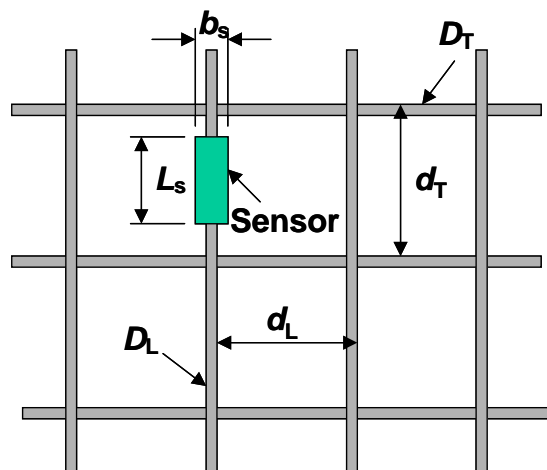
Illustration of reinforcement network in a real concrete structure
